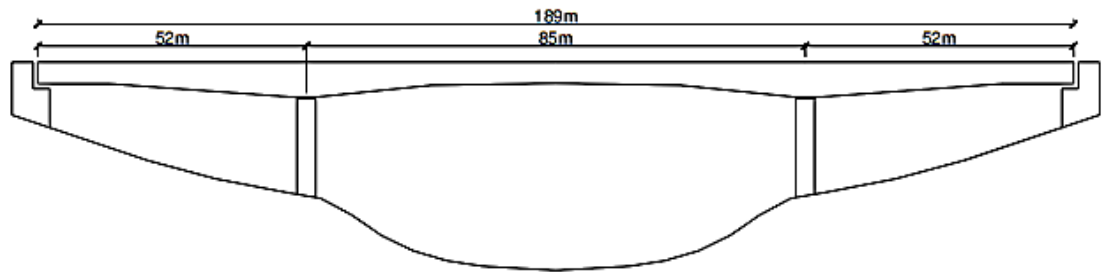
Longitudinal section of Abay River Bridge (1983)
